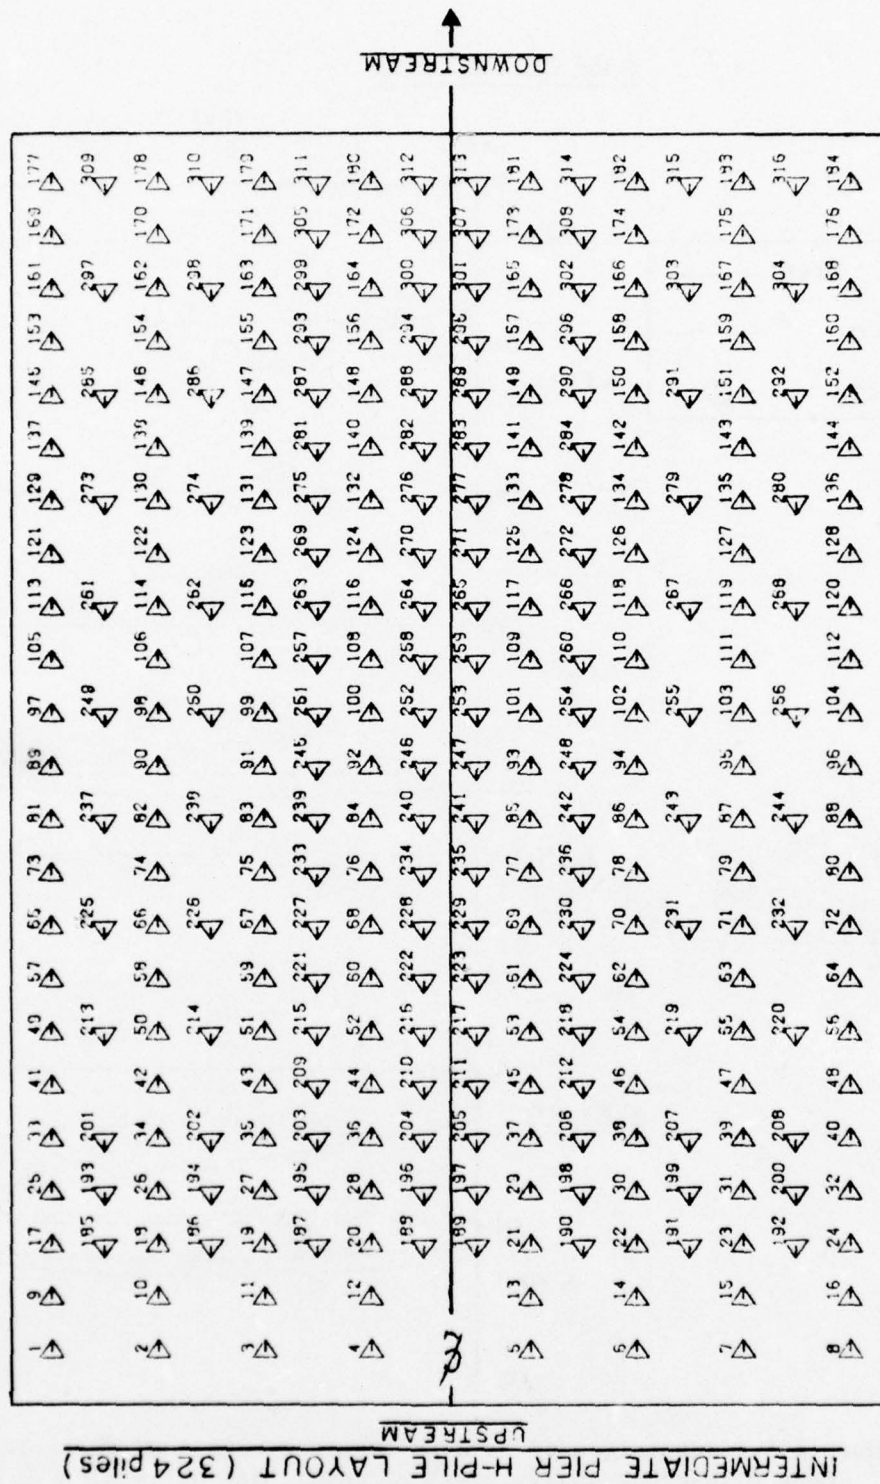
Pile layout used for rigid and flexible base pile-group analysis
